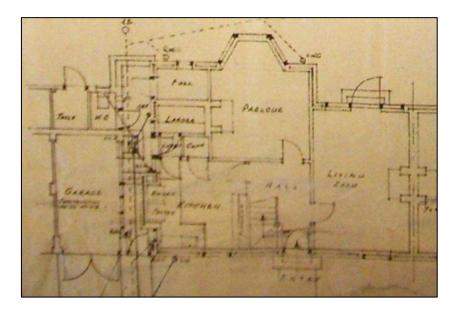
1948 ground floor plan design of 115 Willifield Way (Hampstead Garden Suburb Trust)
